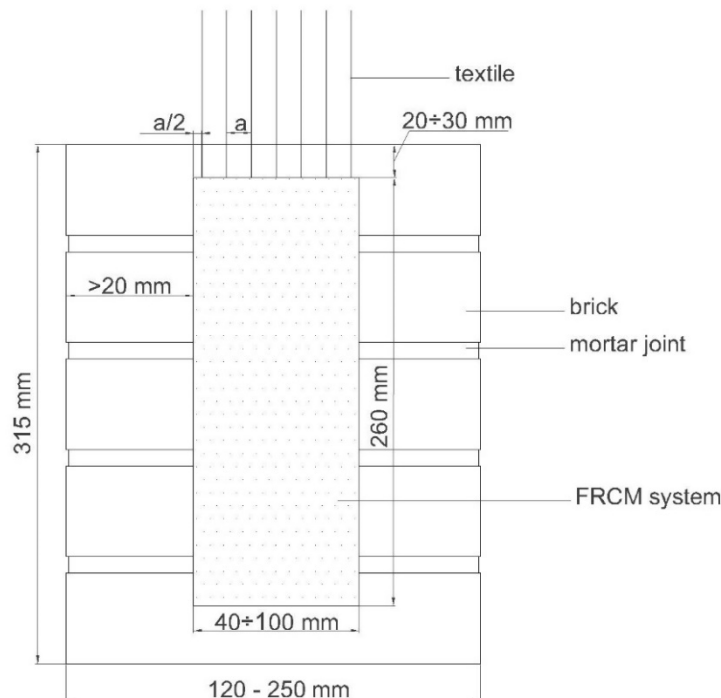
FRCM reinforcement applied on brickwork masonry geometry
